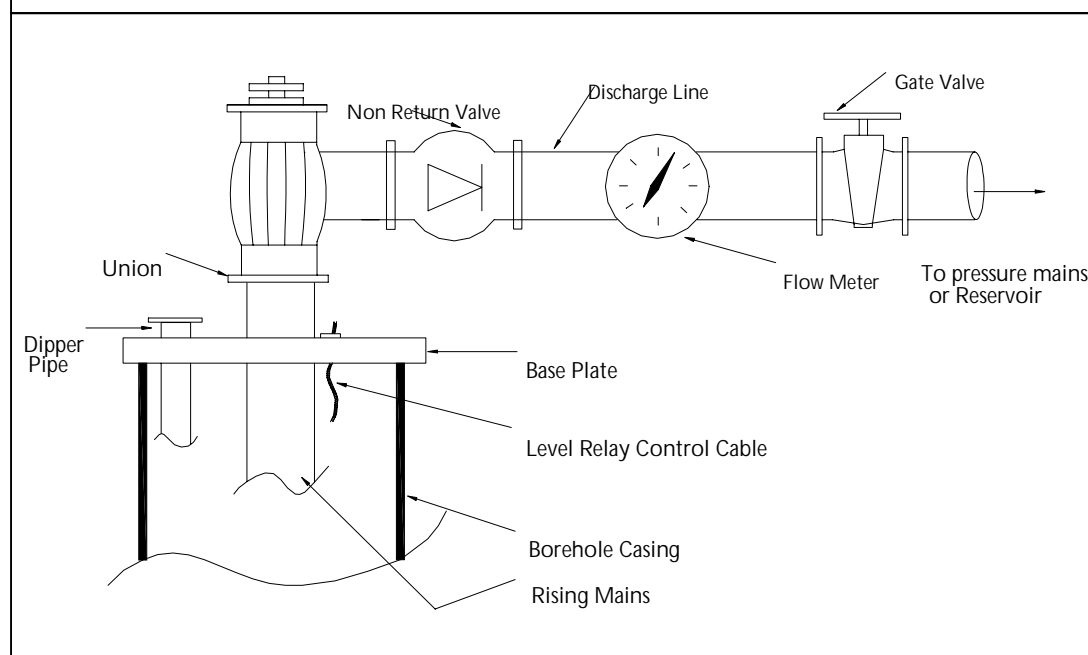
General Layout of Pumping Equipment Installation at the Wellhead –
